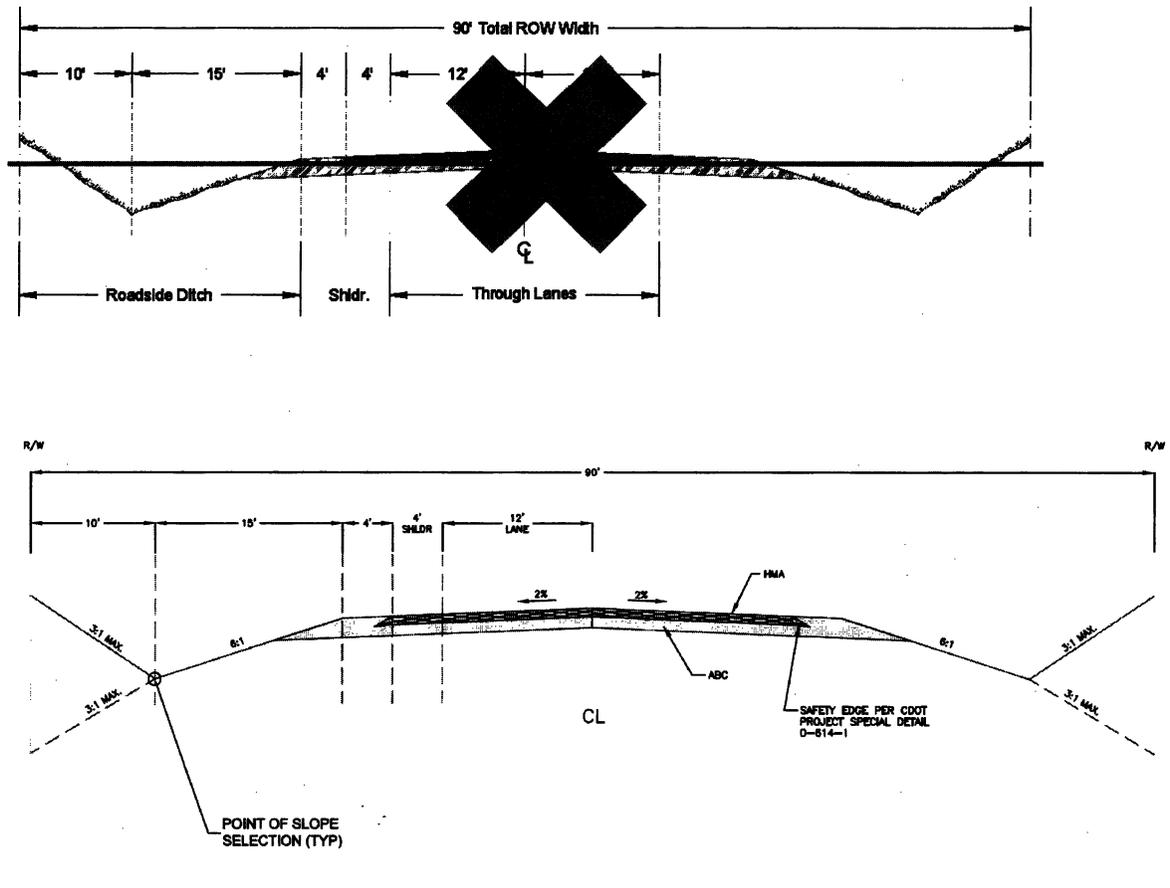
Typical Rural Minor Arterial Partial Cross Section
